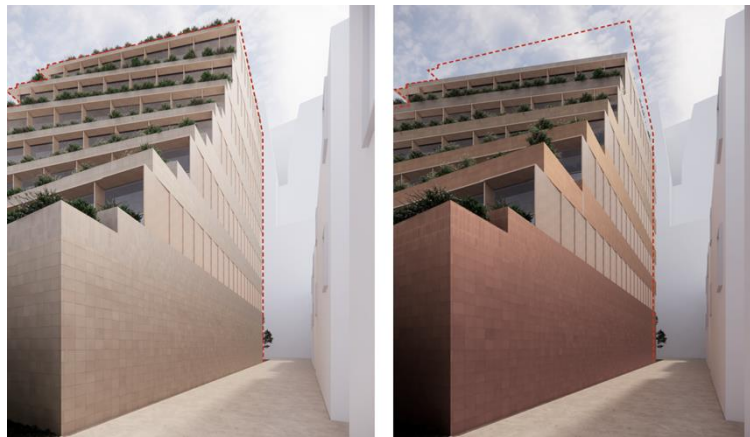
Artist's impression of originally advertised proposal (left) and Section 57A amendment proposal (right), viewed from the north-eastern end of the driveway at No. 7 Sanders Place
